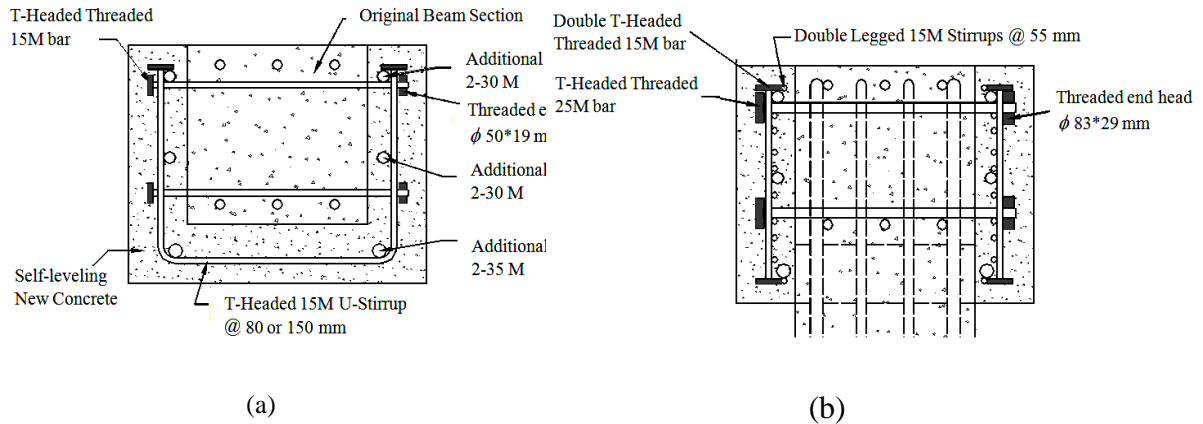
Detail of a) Retrofitted beam section b) Retrofitted beam at joint location
